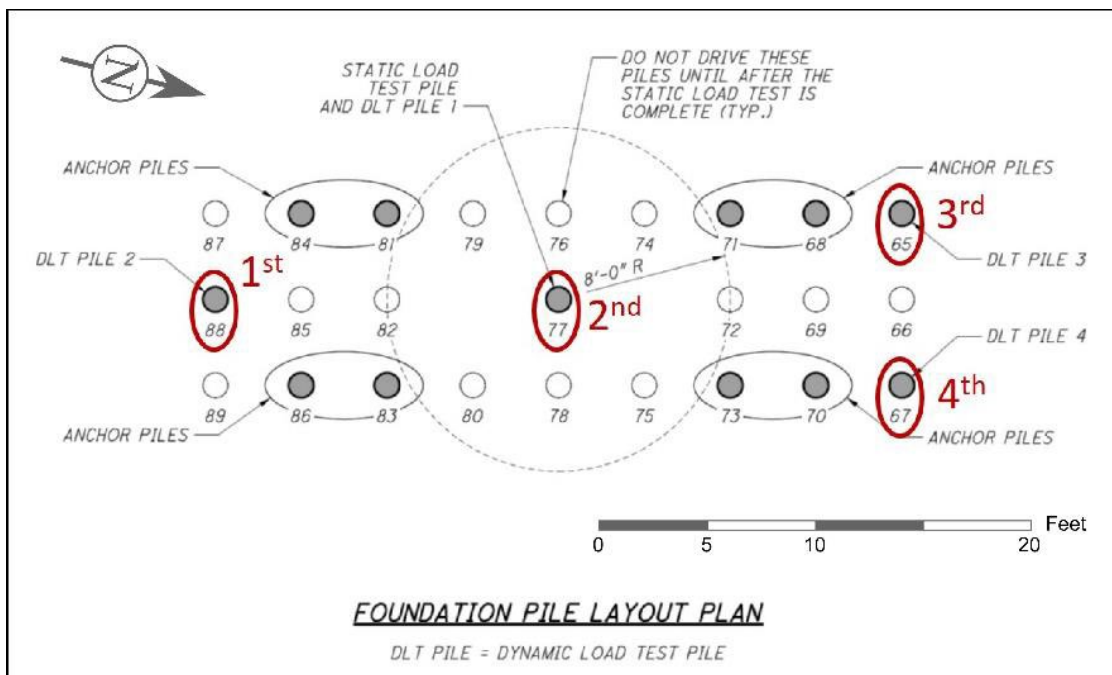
HAM-75 field project center pier foundation and static load test pile layout plan
